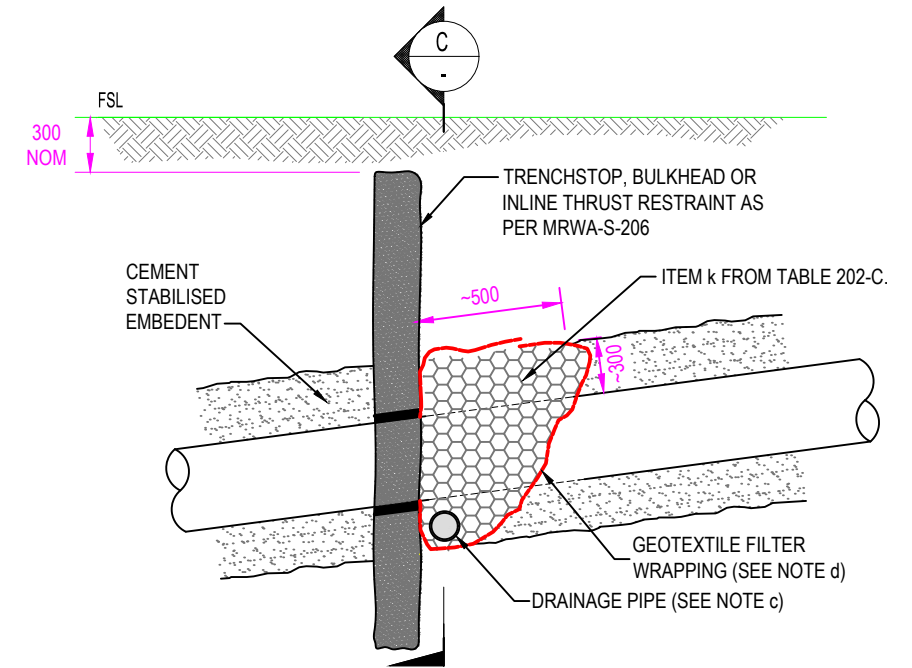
B: TRENCHSTOP WITH DRAIN (SECTION)
